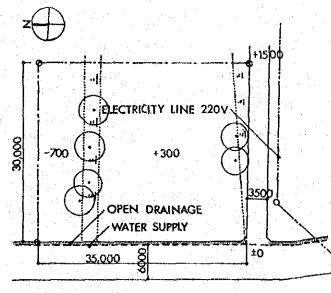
h) Projected Site of the Handcraft Workshop and Garage
